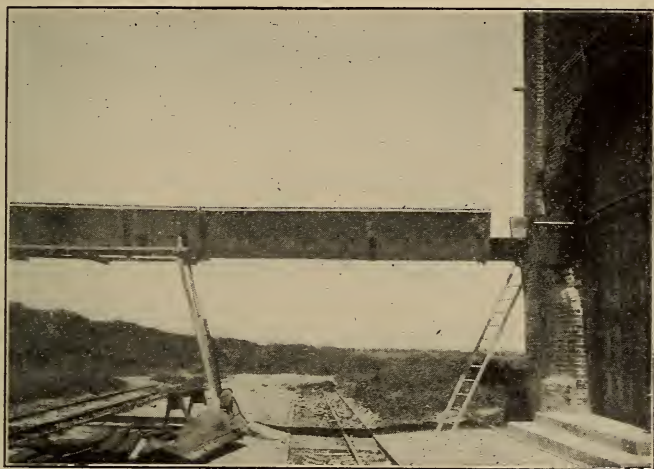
North Wall, the Spreckels Sugar Mill, near Salinas, Showing Ruptured Brick Curtain Walls and the Advantages of a Class A Steel Frame.
